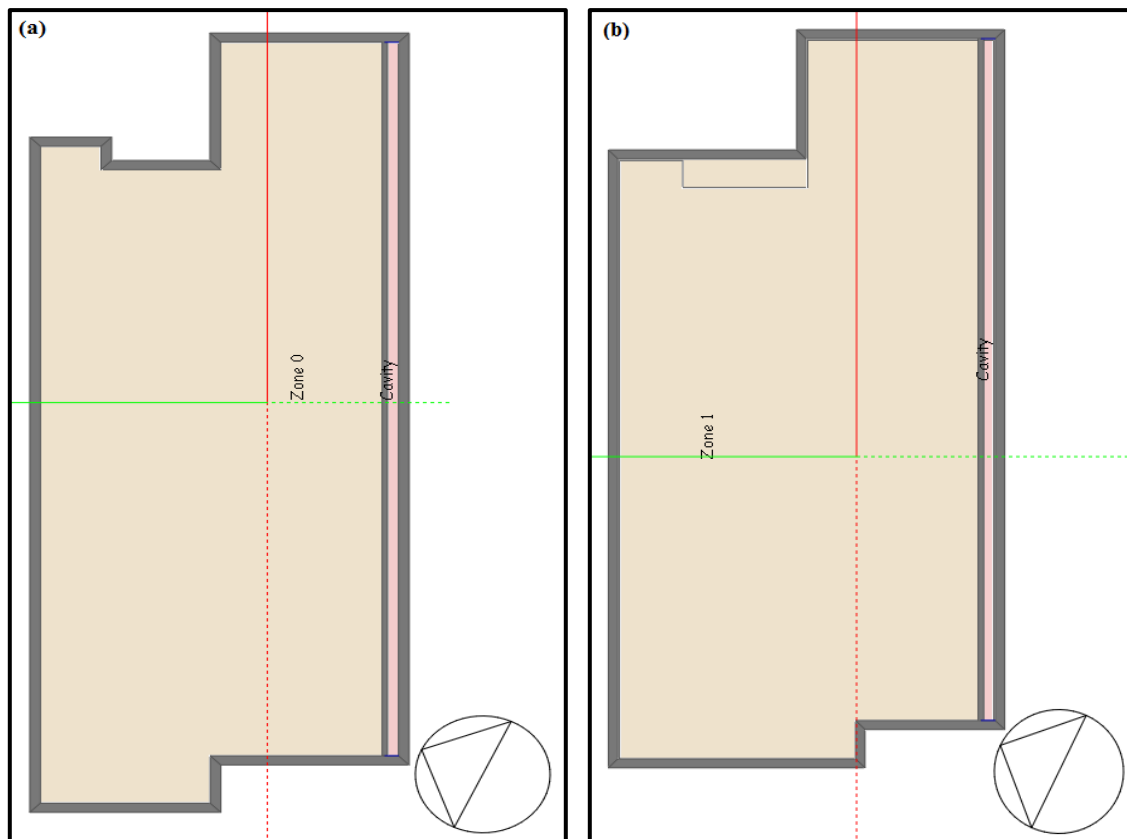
Double Skin Curtain Wall System (a) Ground Floor, (b) First Floor
